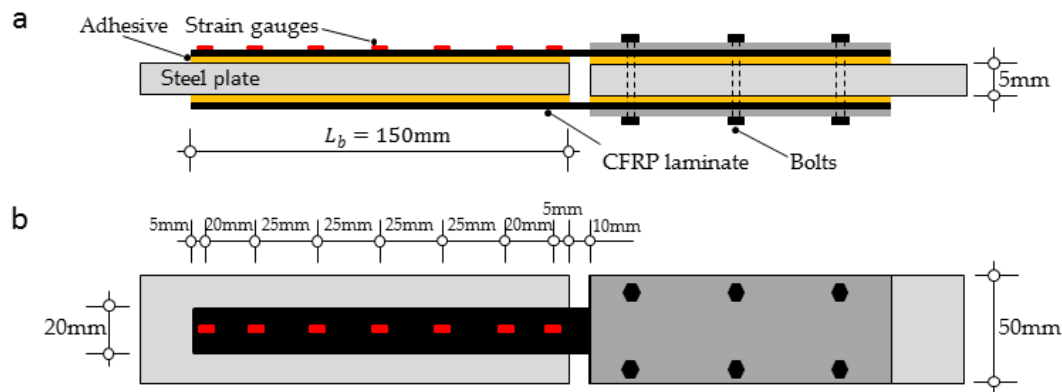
CFRP-to-steel bonded joints: (a) side view; and (b) front view.
